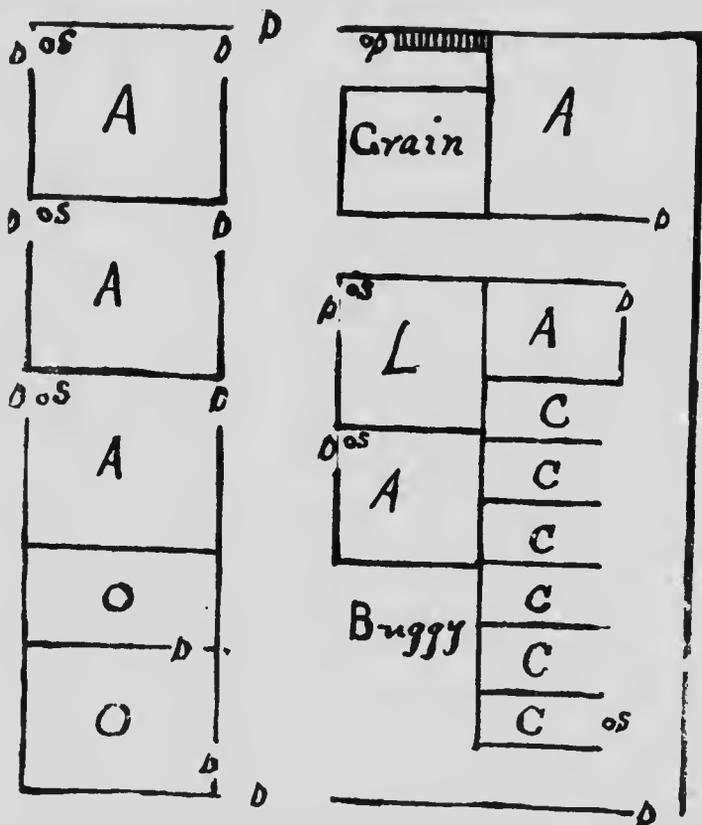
Ground floor plan of barn shown in figure 91. A—box stalls; C—open stalls; O—office; L—breeding room; S—sewer.
